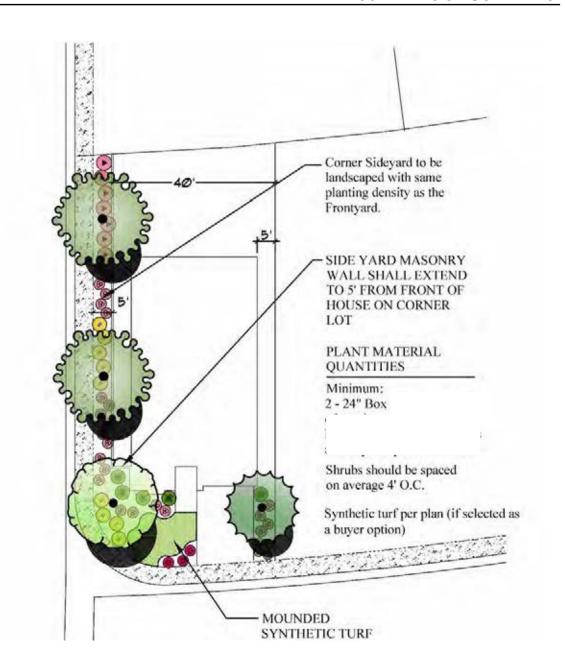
TYPICAL CORNER LOT, 40' LOT
